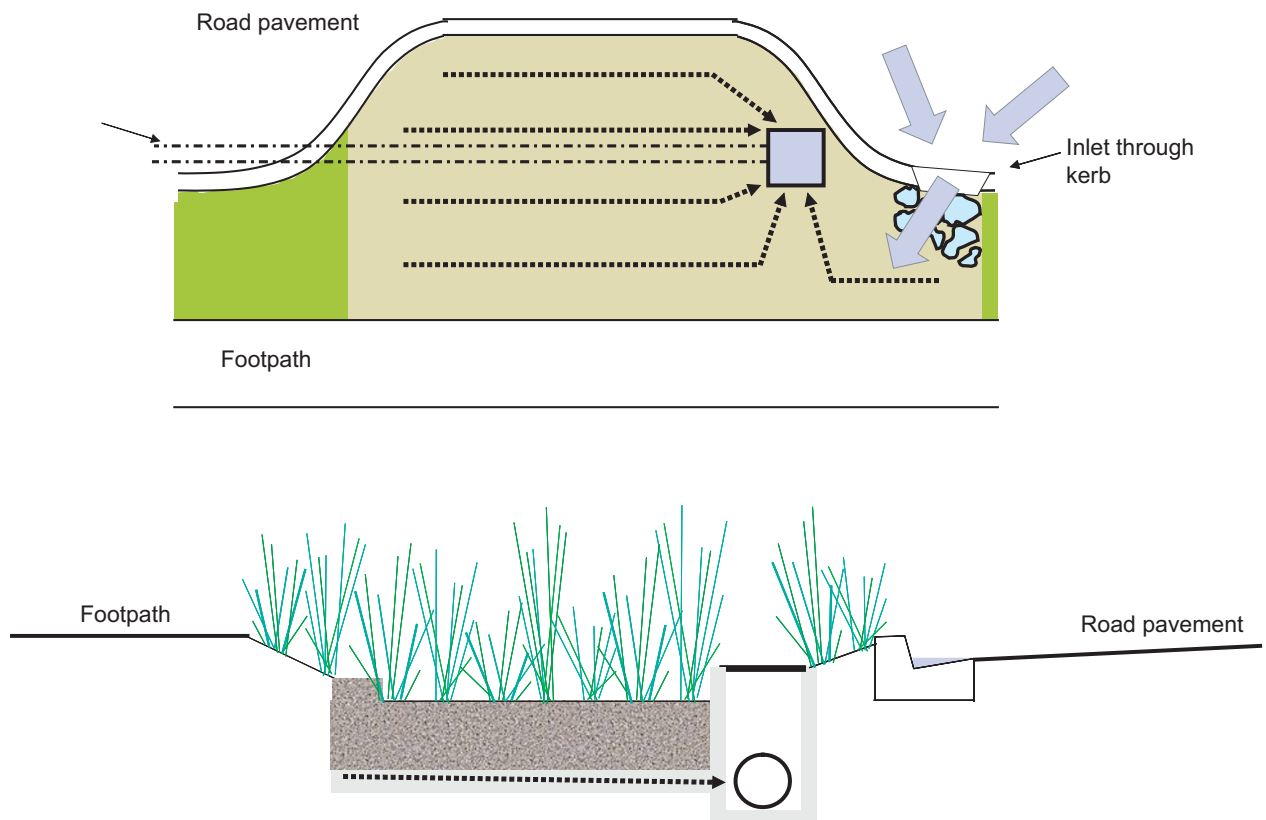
General layout and cross section of proposed bioretention system in inner Melbourne.
